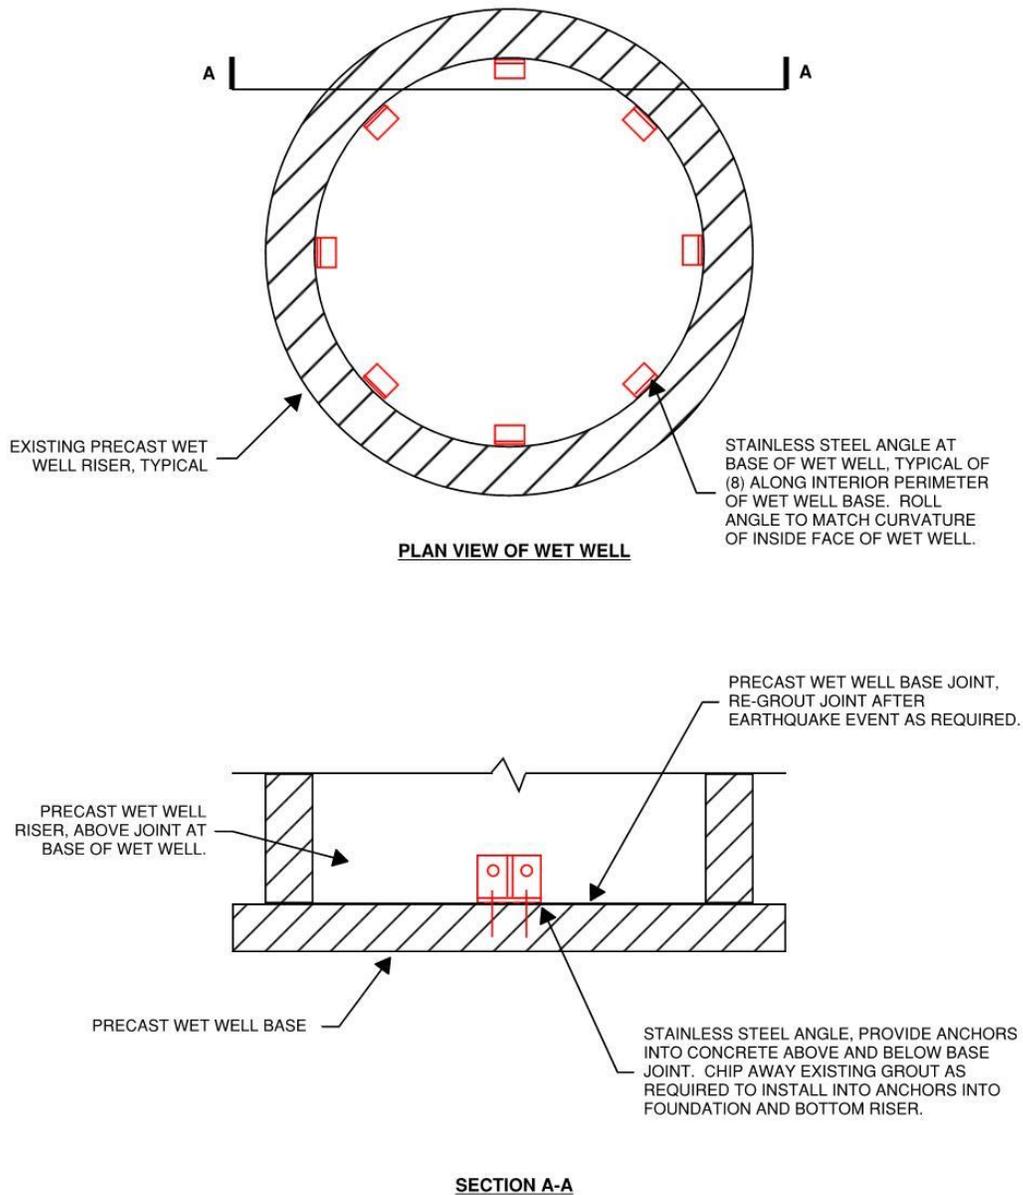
Precast Riser Joint at Foundation Strengthening Concept
